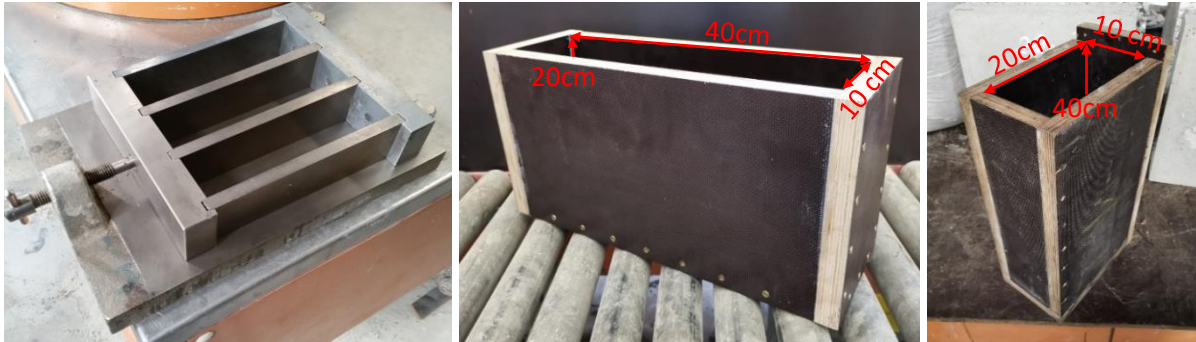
Mould and dimensions of the samples: (left) prisms, (middle and right) masonry blocks
